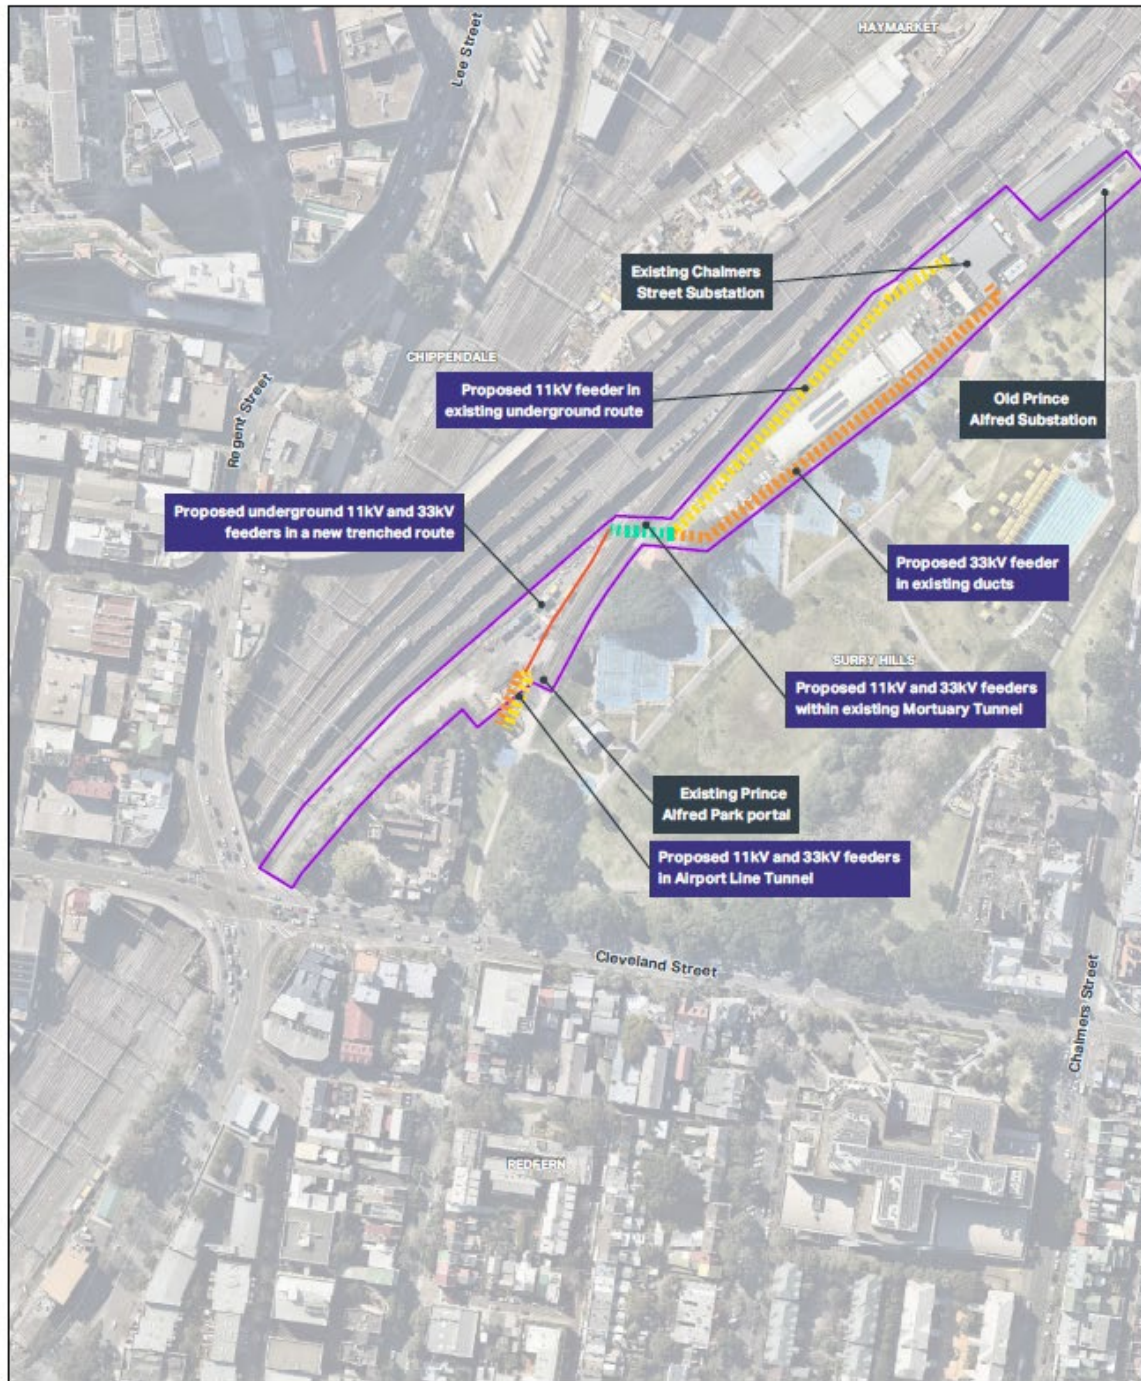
PROPOSED WORKS AT CHALMERS STREET SUBSTATION
